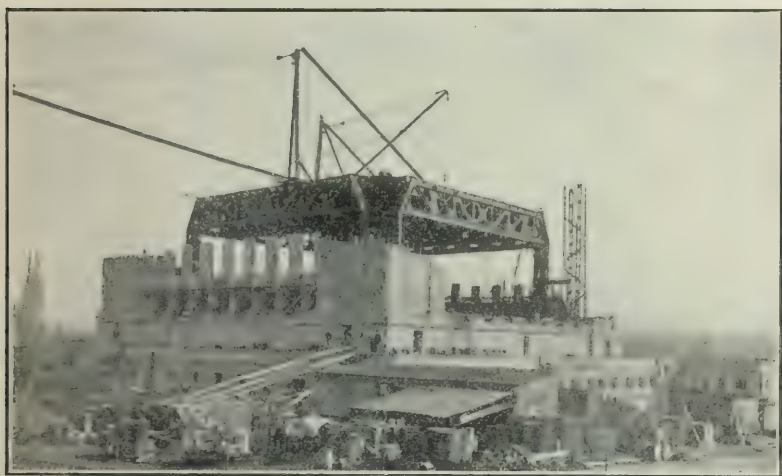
View during construction showing trusses for supporting the banquet hall.
